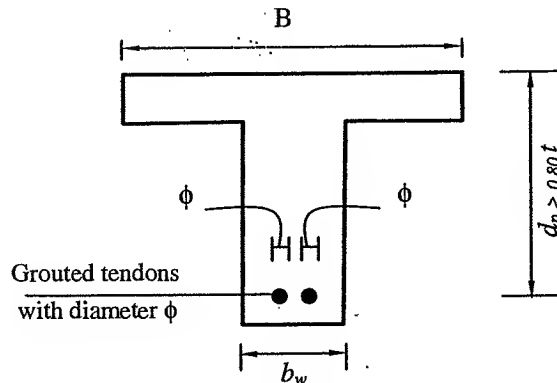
Effective width for prestressed beams with grouted ducts
